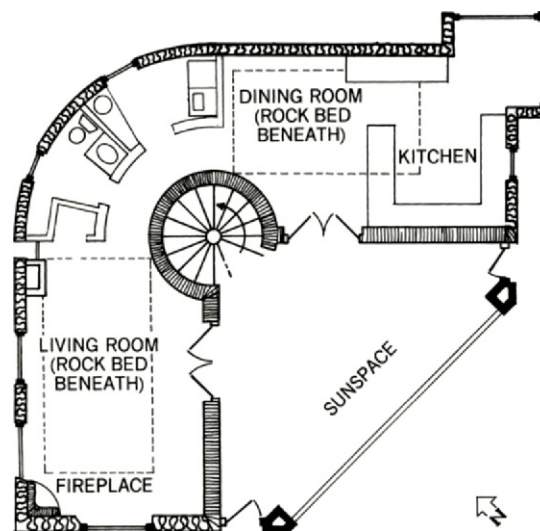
This plan of the Balcomb House shows how the building surrounds the sunspace.
